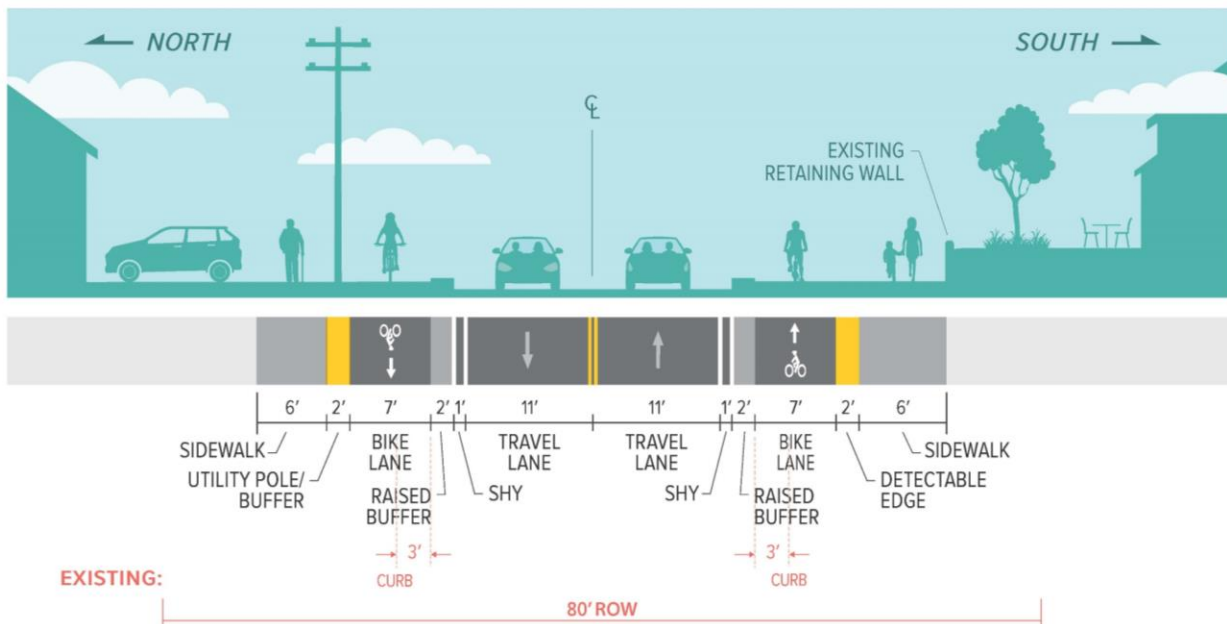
FRANKLIN AVENUE ALTERNATIVE C CROSS SECTION
